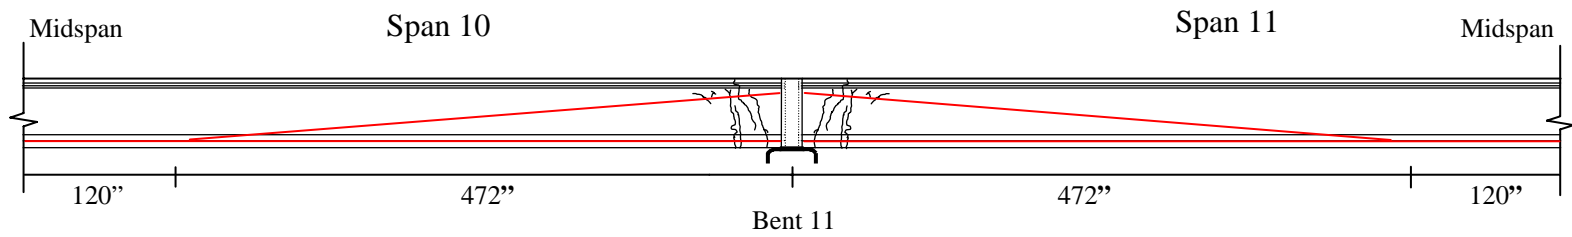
Girder Line 8 Cracks with Seams Superimposed (Fason and Barnes 2004)
